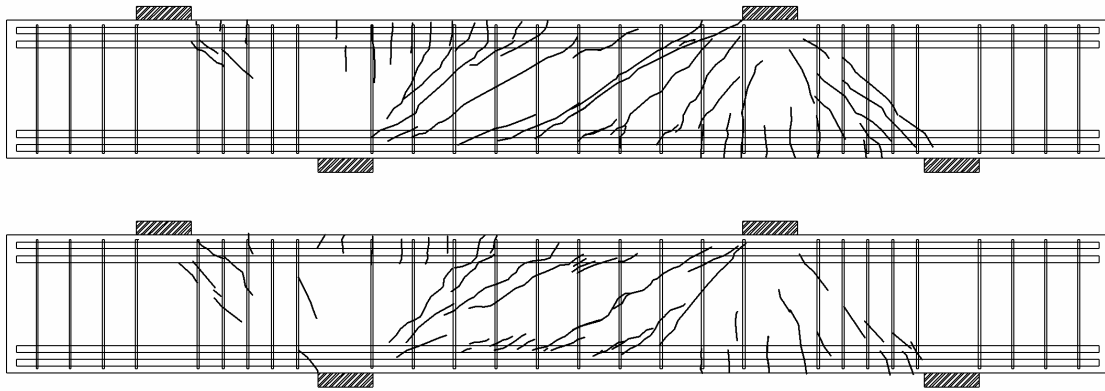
Typical crack pattern of continuous beam. *Top* – (BL1); *Bottom* – Bond split crack along flexural reinforcement (BG1)
